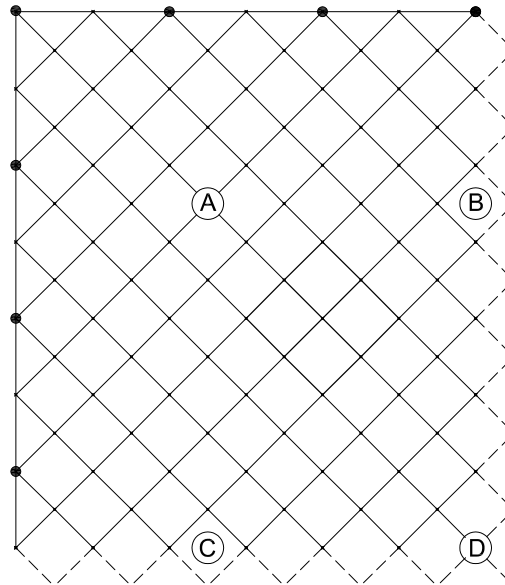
Quarter of plan showing the points checked for deflection.
